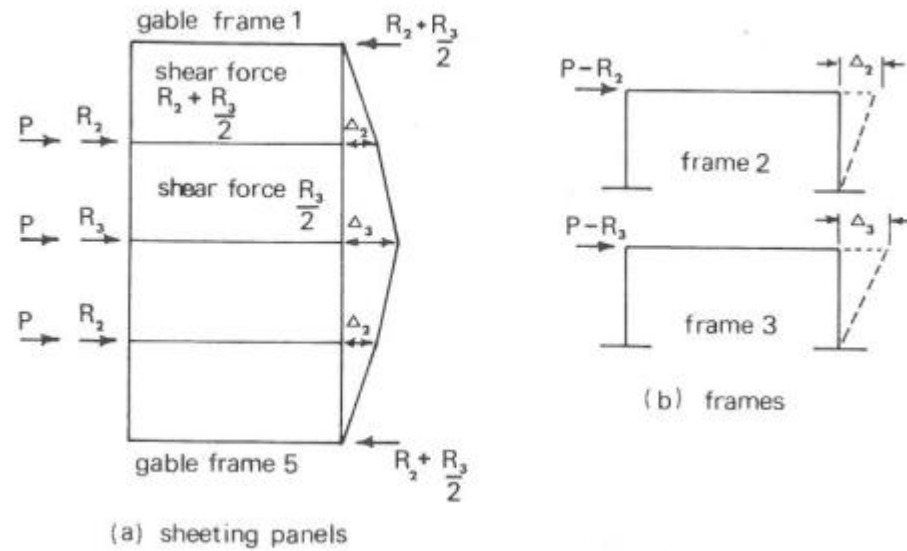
Forces and deflections of components of building (a) sheeting panels. (b) frames
